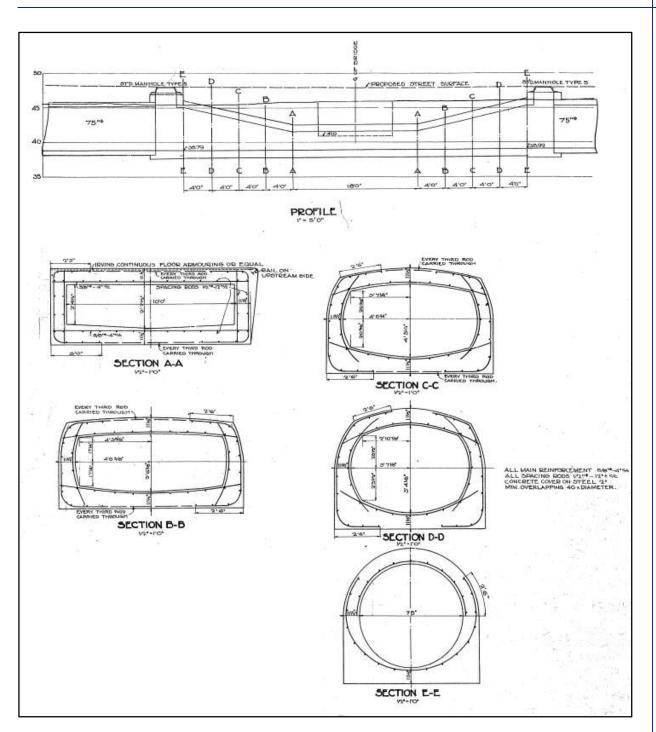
Profile and Cross-Sectional Views of the Depressed Pipe Located at Vauxhall Road
